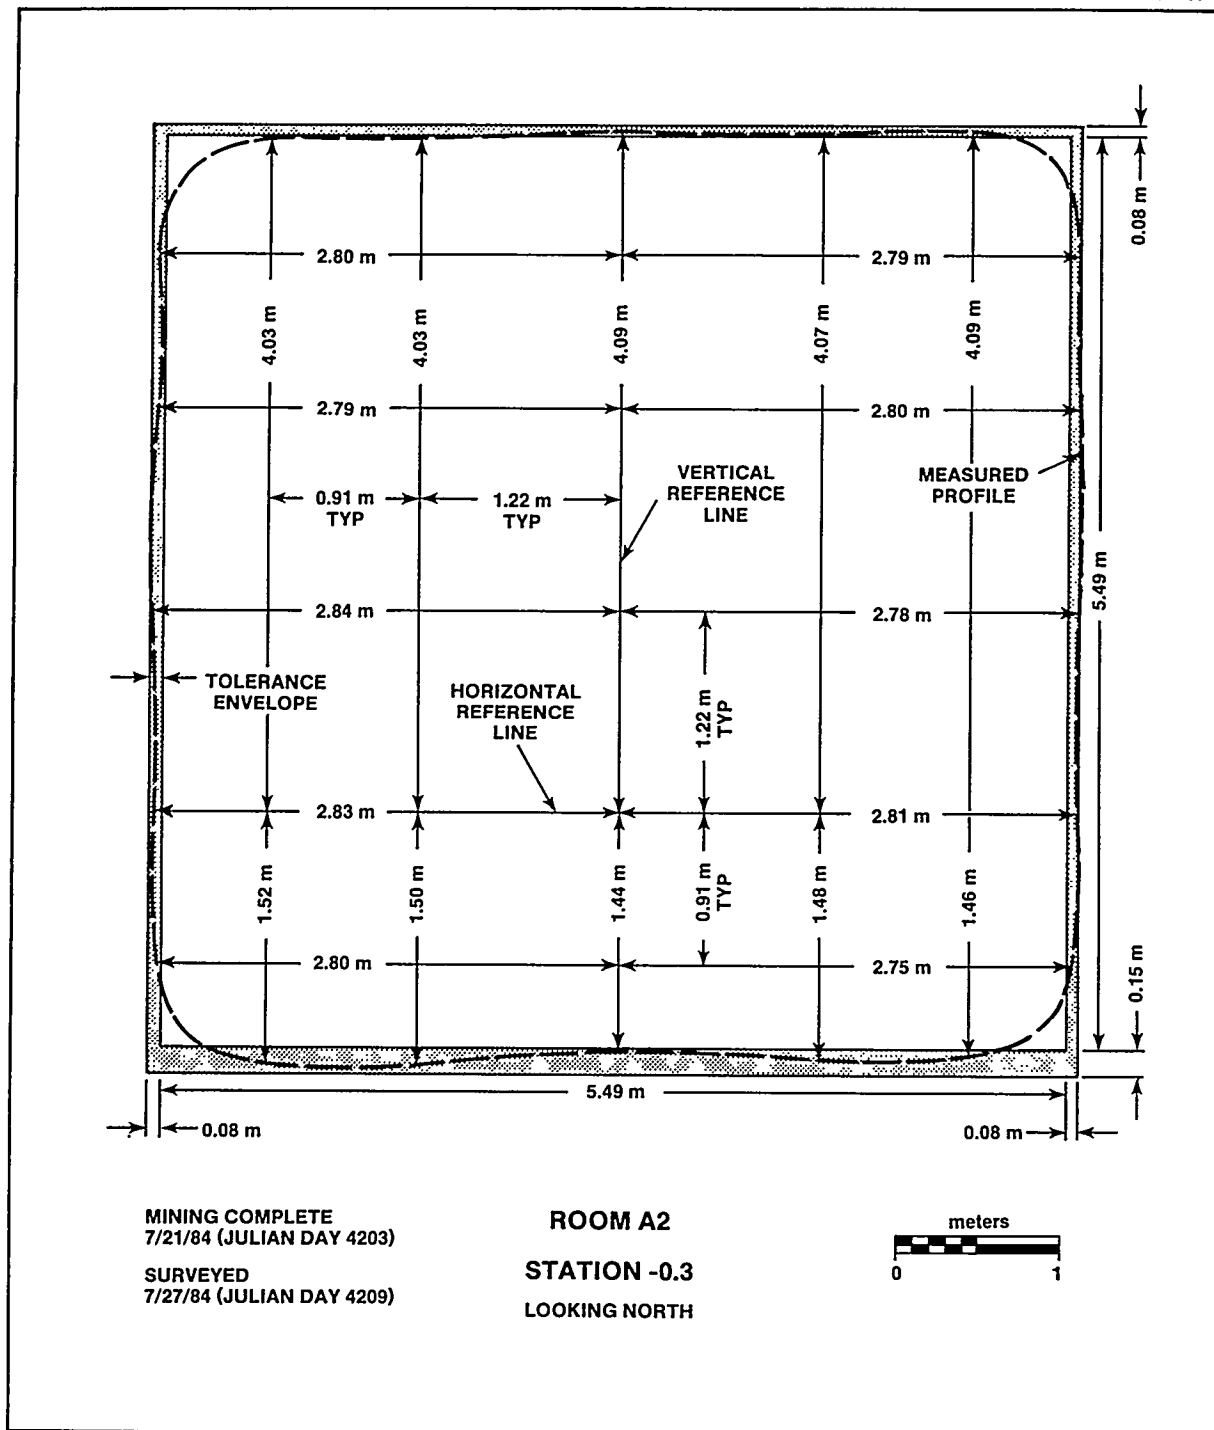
As-Built Cross Section of Station -0.3 m, Room A2
